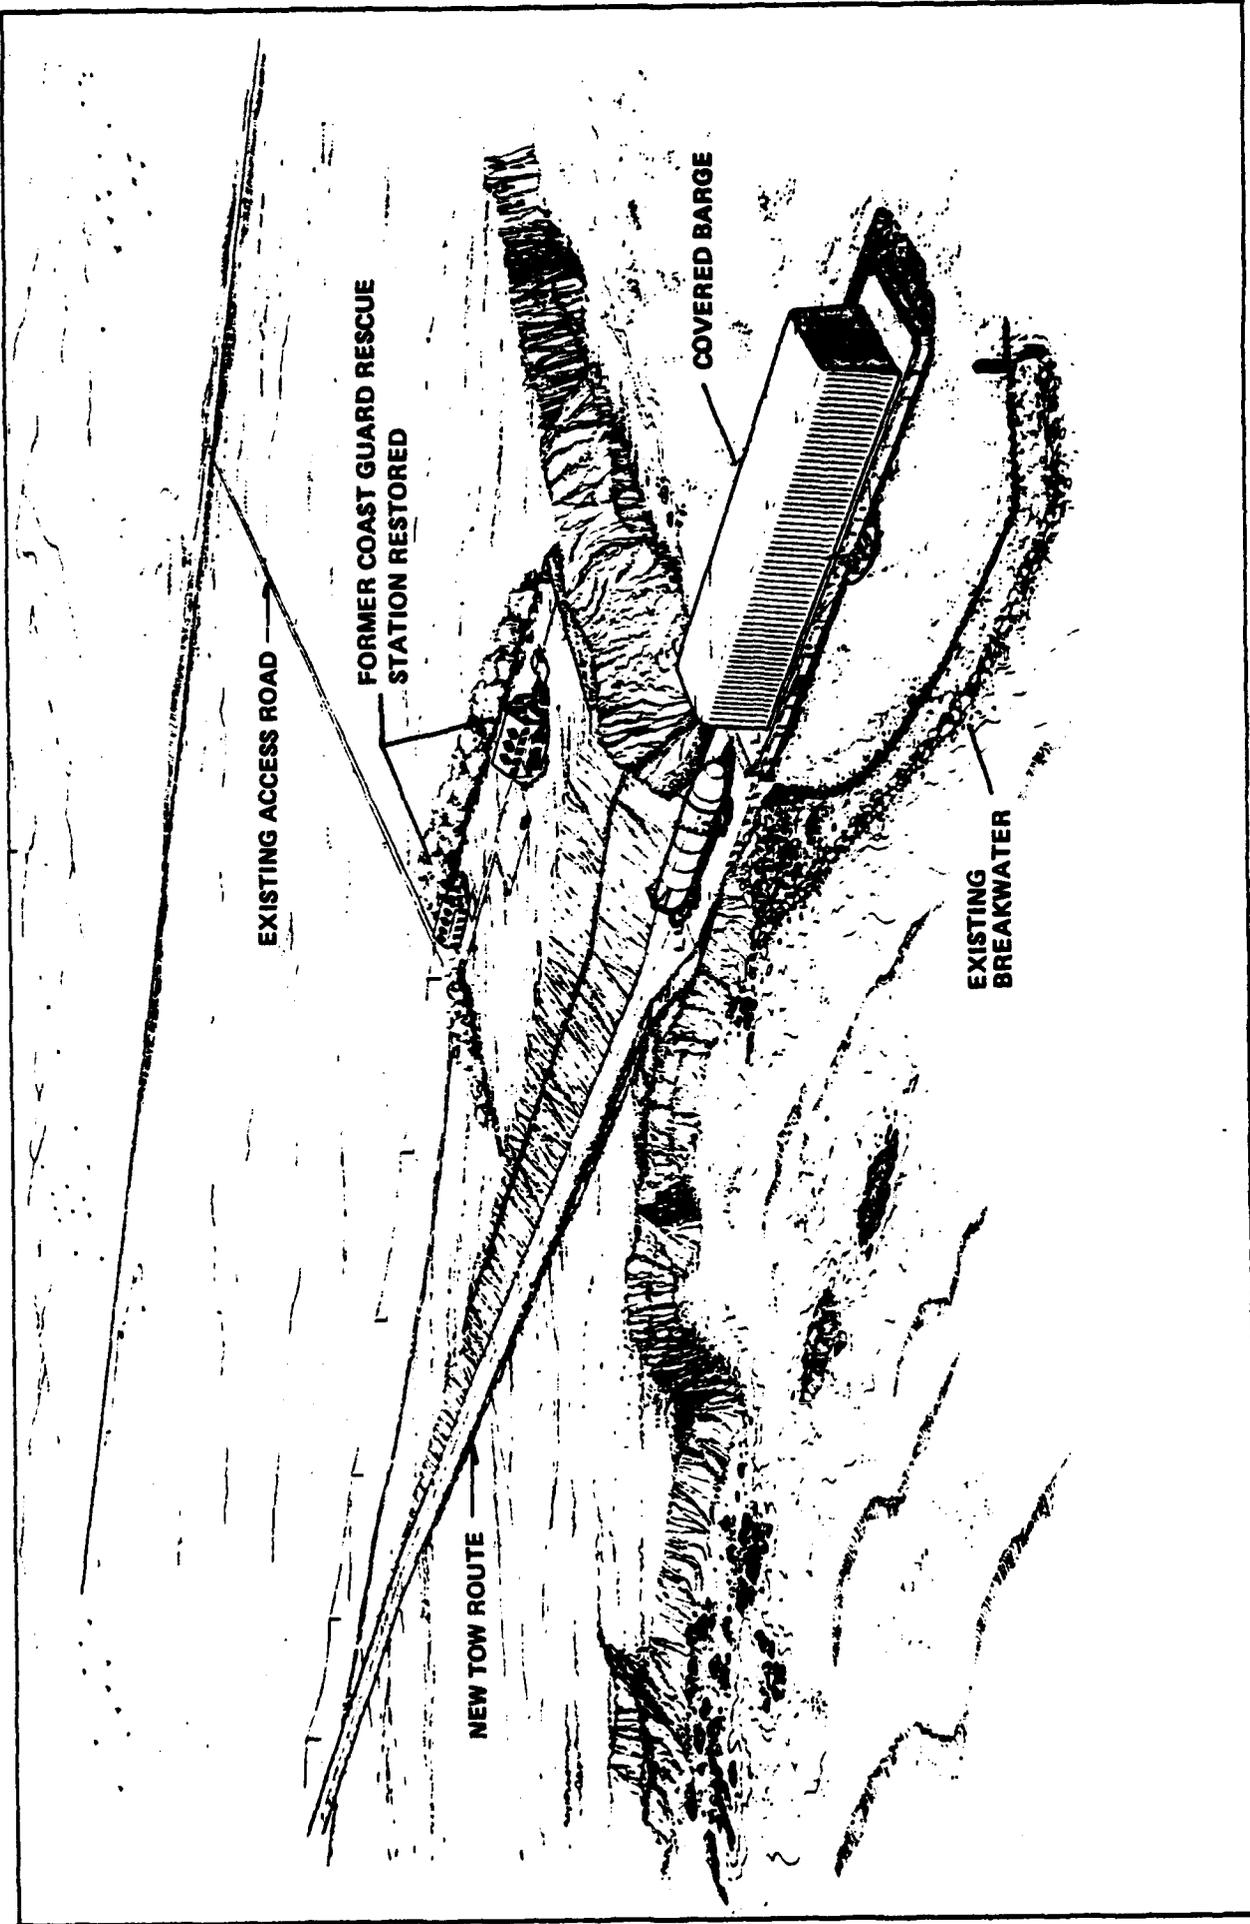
A. ARTIST'S CONCEPTION OF EXTERNAL TANK LANDING FACILITY AT THE POINT ARGUELLO COAST GUARD STATION
